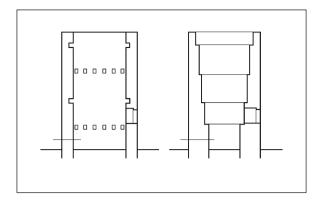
A schematic depiction of bergfried construction: installing support beams (left) and stepped construction (right; after Krahe 2002b, Abb. 65; drawings: T. Korošec).
